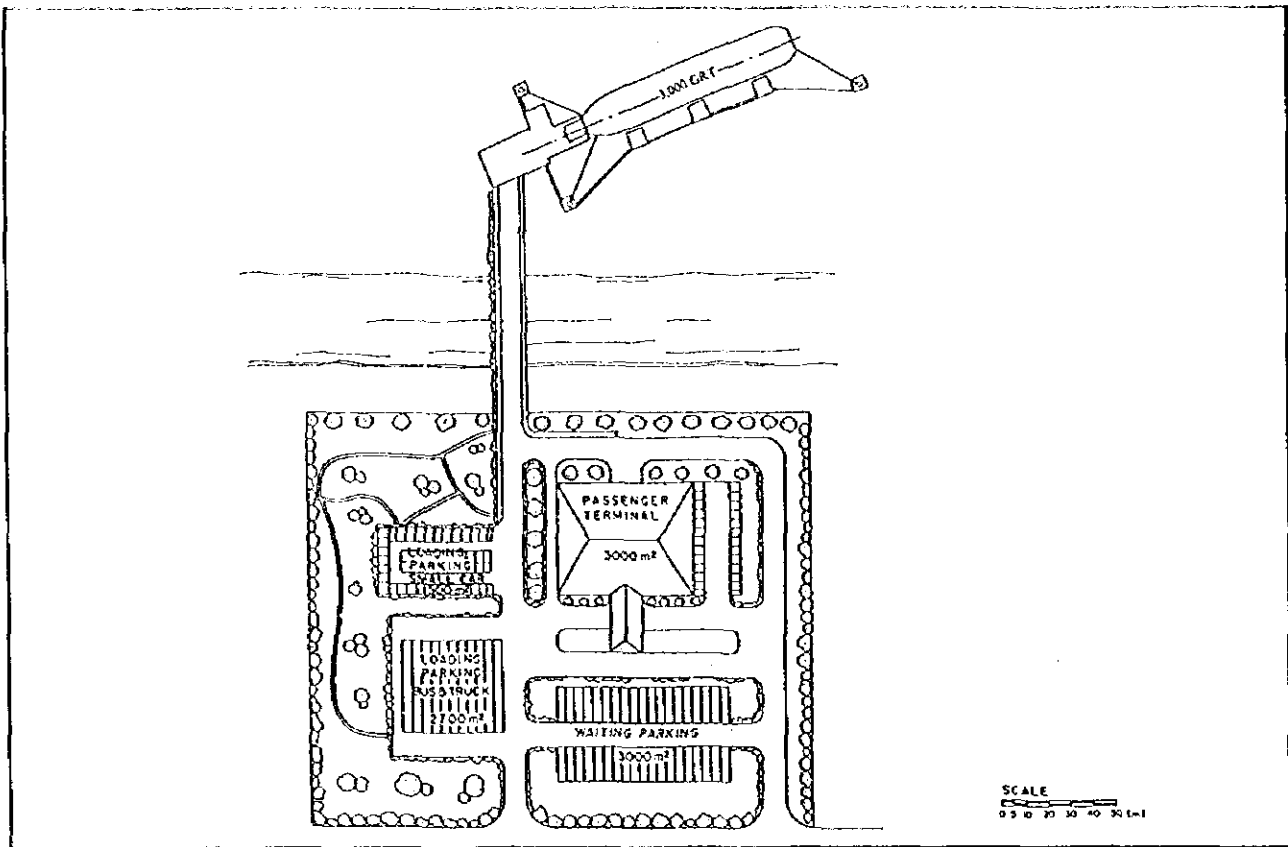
General Layout Plan of Ferry Terminal (3,000 GRT)
